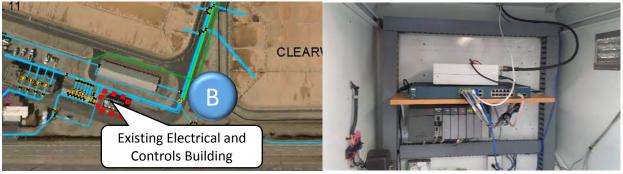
Existing Electrical and Controls Adjacent to Proposed Location "B", Existing Switch (Right)
